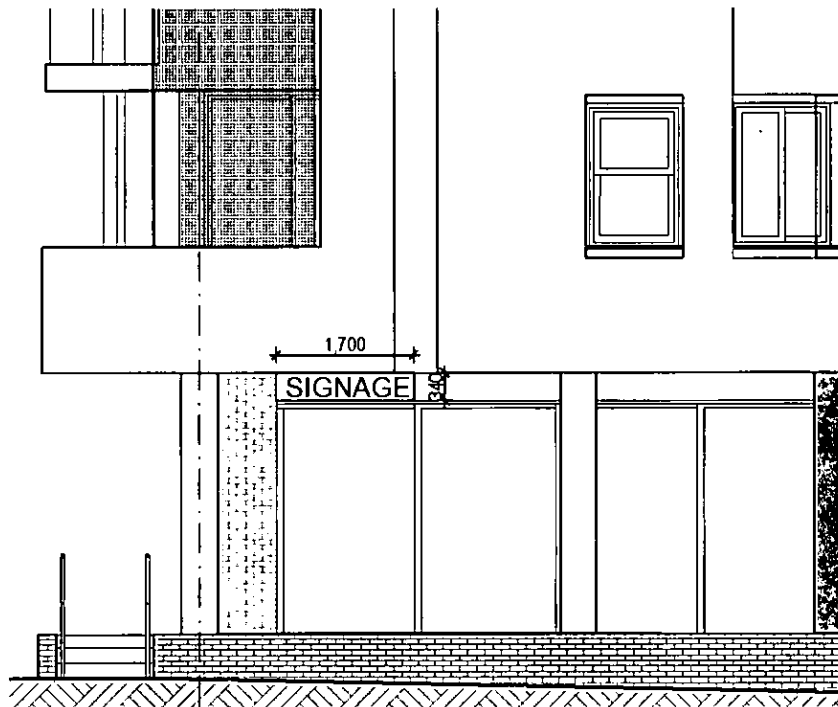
Retail (Lot 68) Elevation, Location and Size Plan
